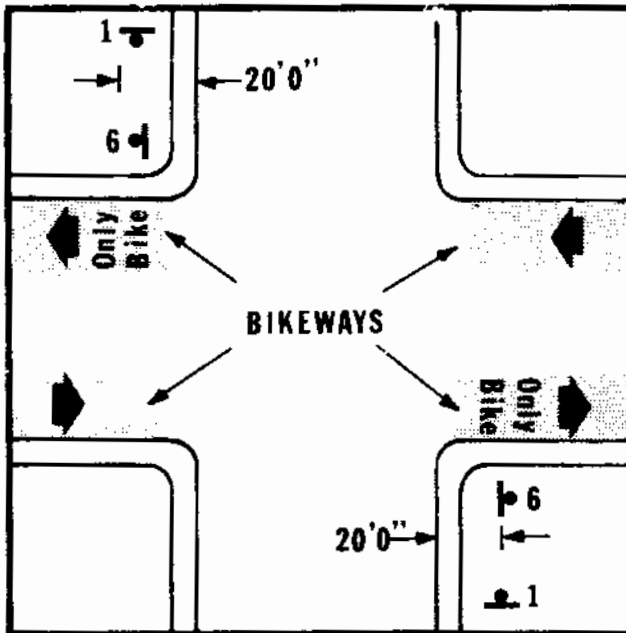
TYPICAL BIKEWAY INTERSECTION SIGNING IN PLAN
